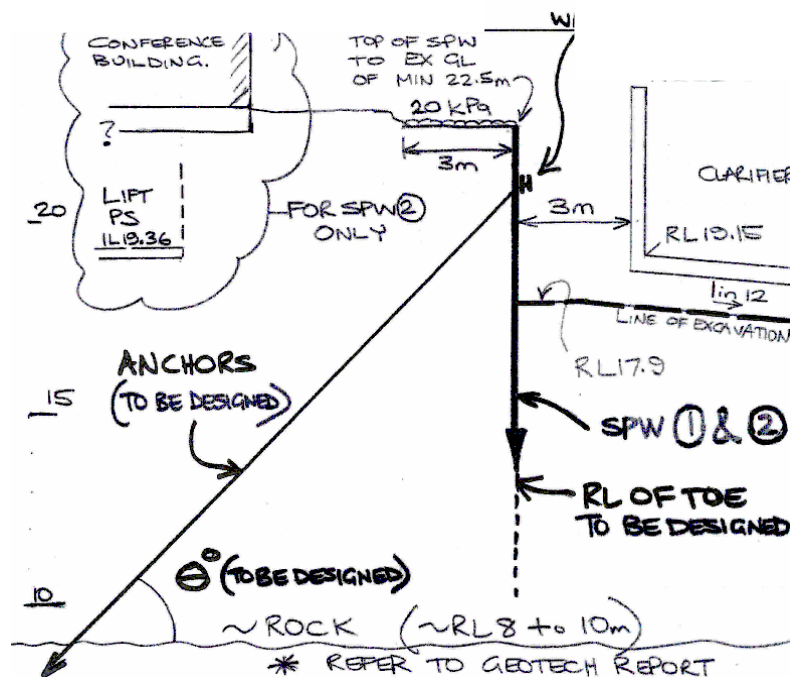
Schematic design of anchored wall (Note: Sydney Water datum used +20 m AHD).
